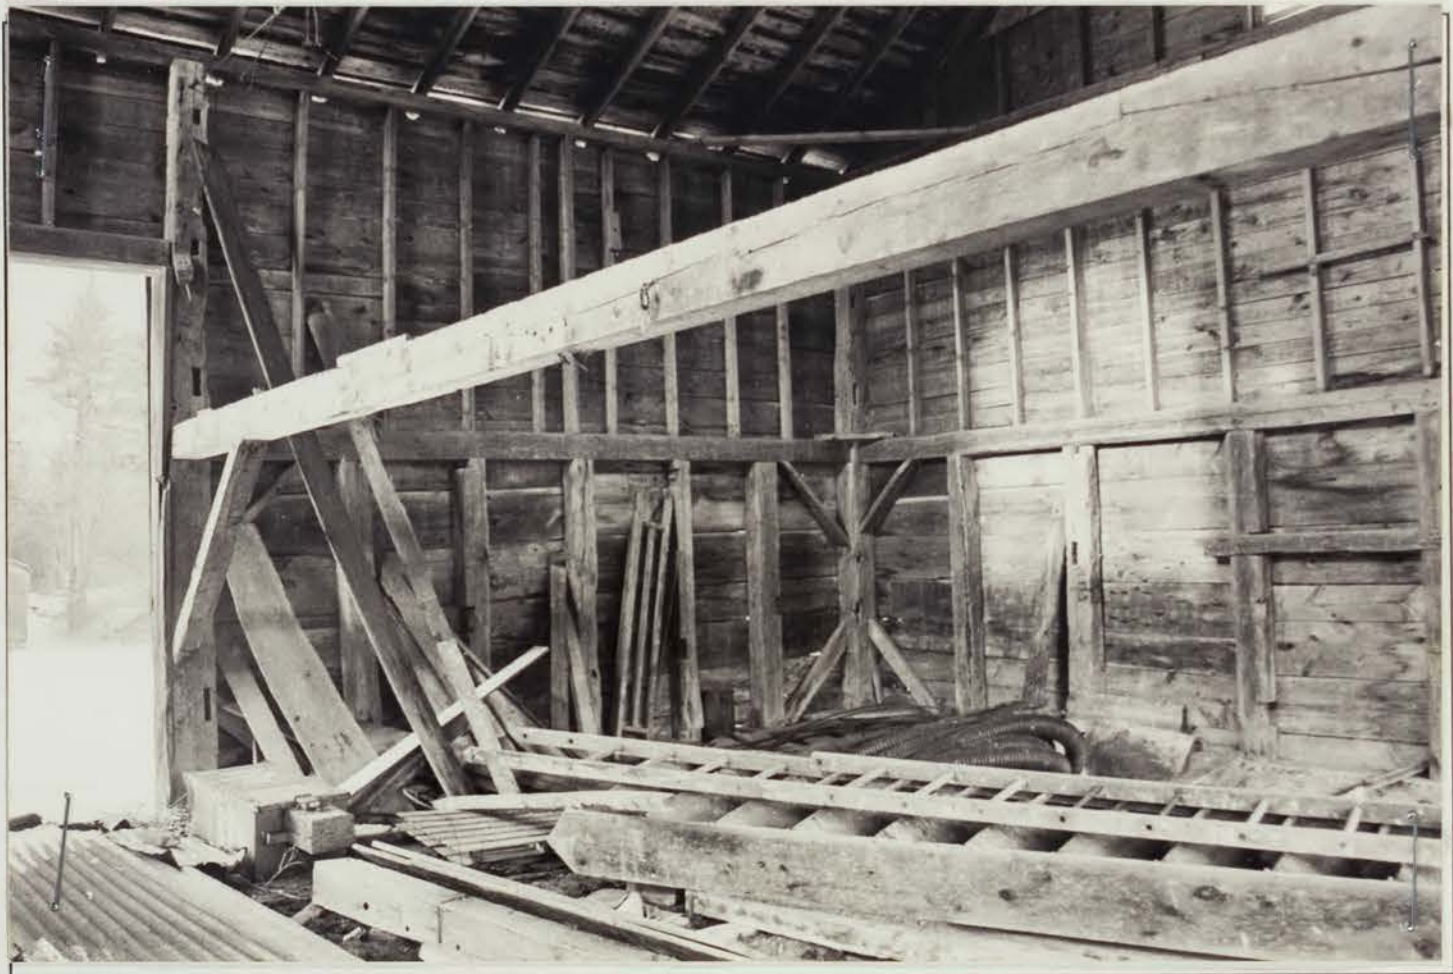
description: Interior framing of barn, looking at NW corner of north bay from drive bay
